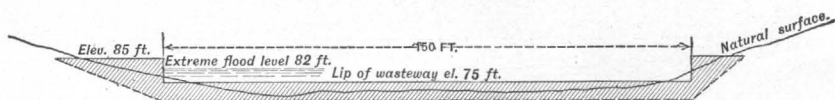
Cross section of wasteway, rock-filled dam, East Park dam site.
